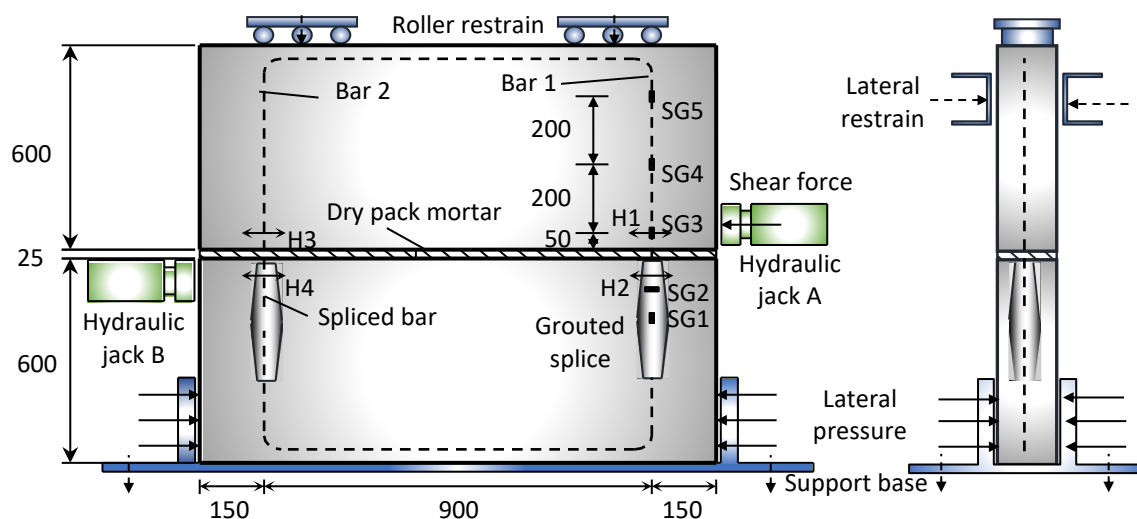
Details and instrumentation of wall assembly specimen (units in mm)
